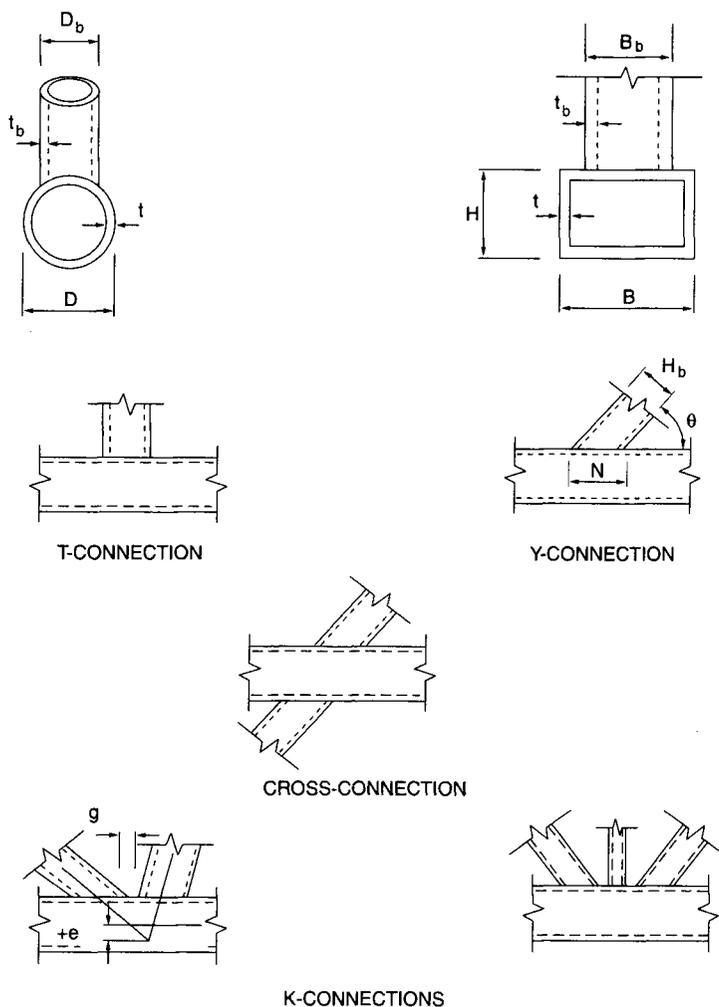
HSS-to-HSS truss connection configurations.
